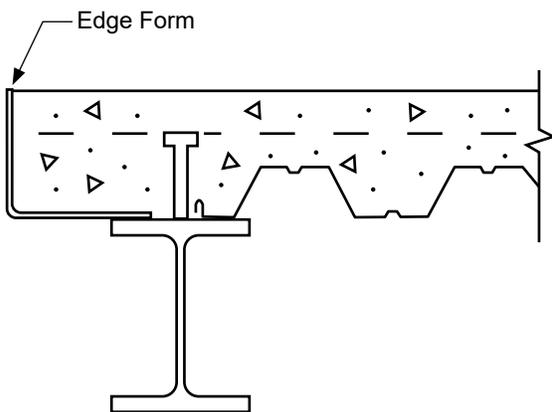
SINGLE PIECE EDGE FORM PARALLEL TO DECK ON WIDE FLANGE BEAM
